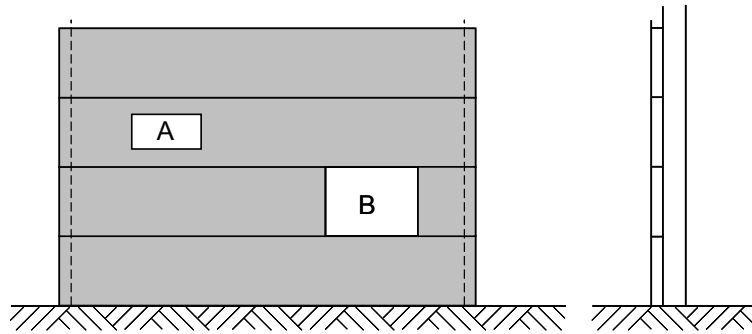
Small and full-width openings in sandwich panel walls (ECCS & CIB, 2010).
